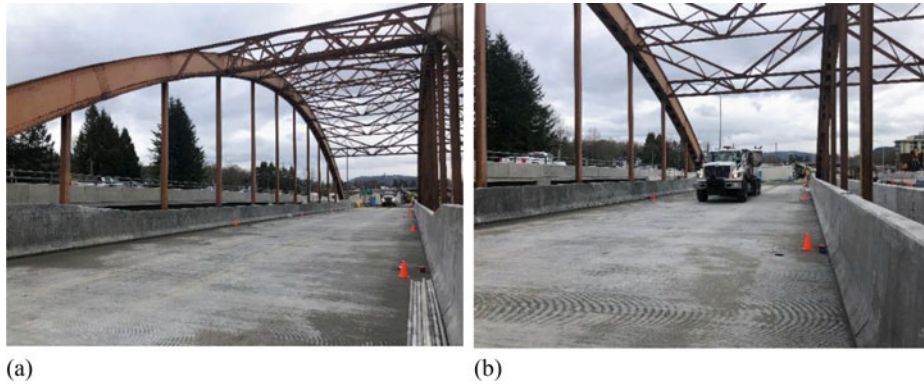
Location of sensors in speed test: (a) fully loaded truck prior to testing and (b) fully loaded truck while crossing the bridge
